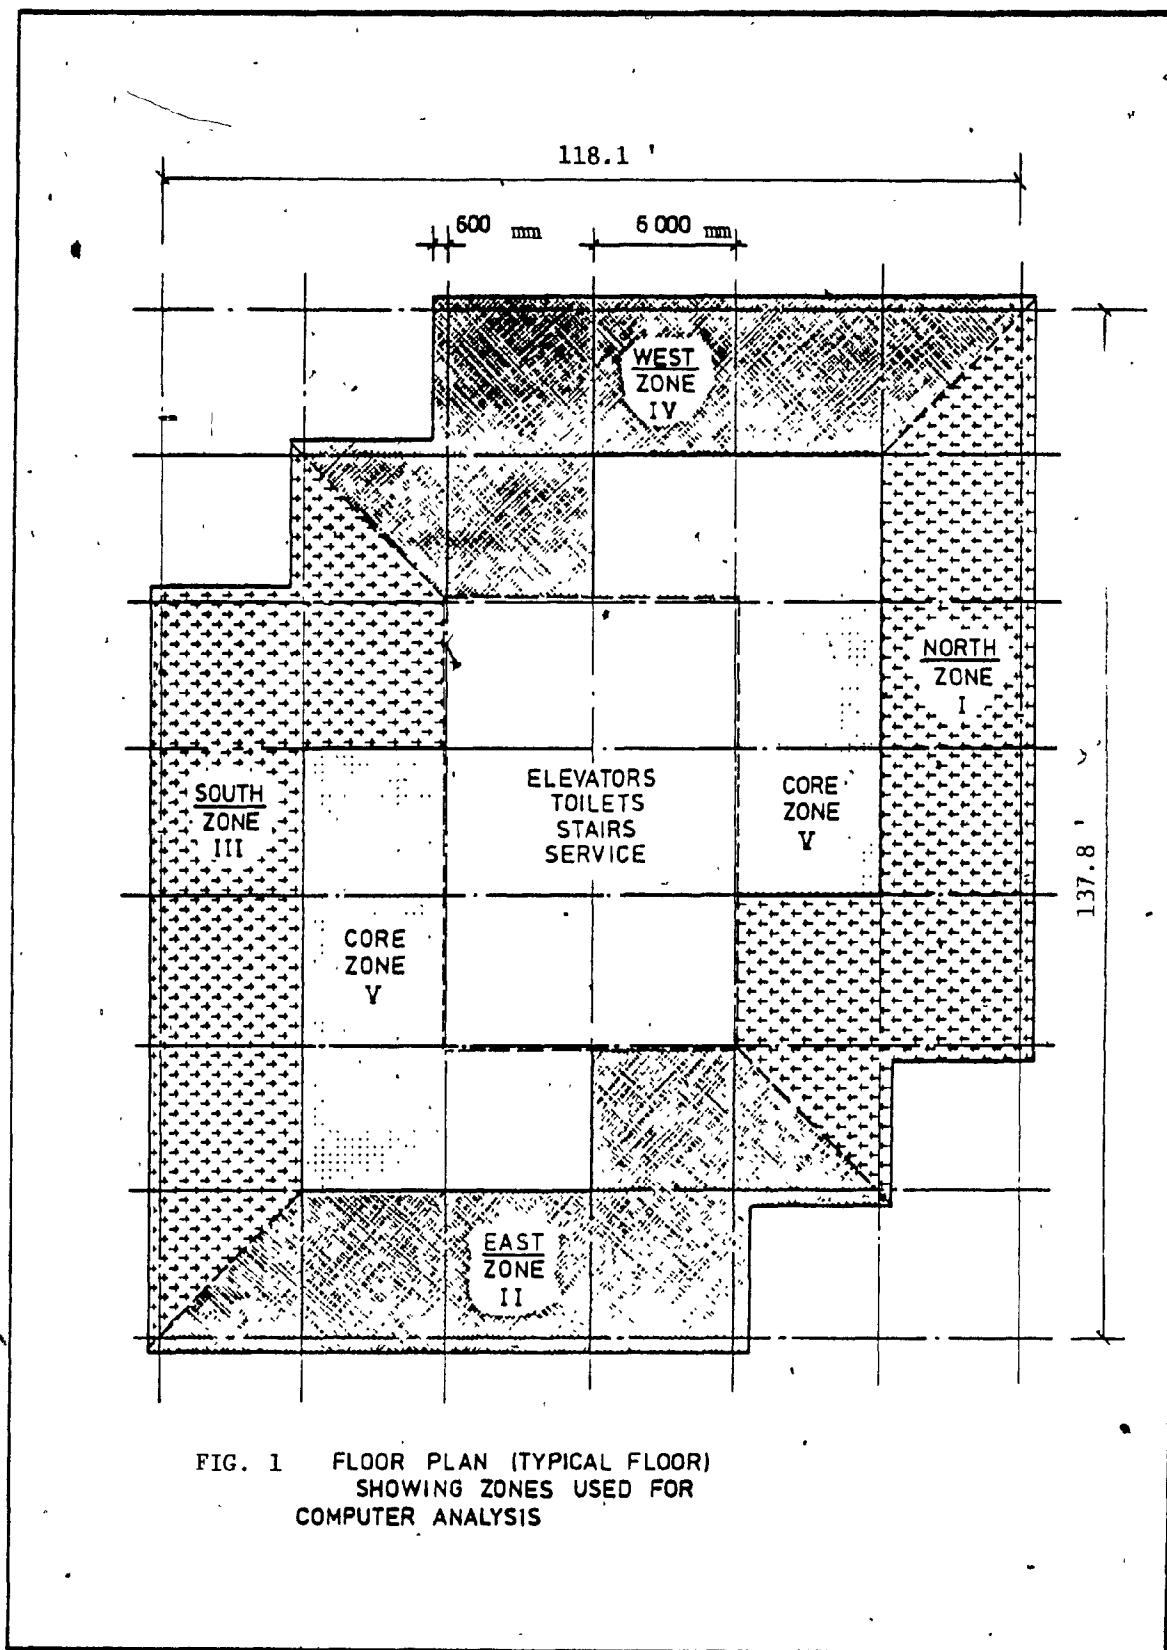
FLOOR PLAN (TYPICAL FLOOR)
